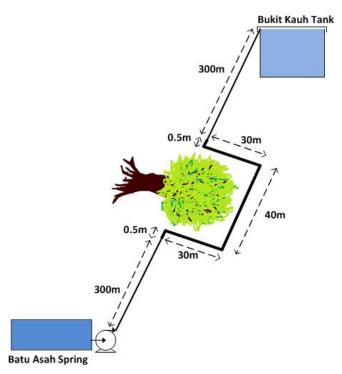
New arrangement of the pipes from Batu Asah spring (new pipe shown in bold)
